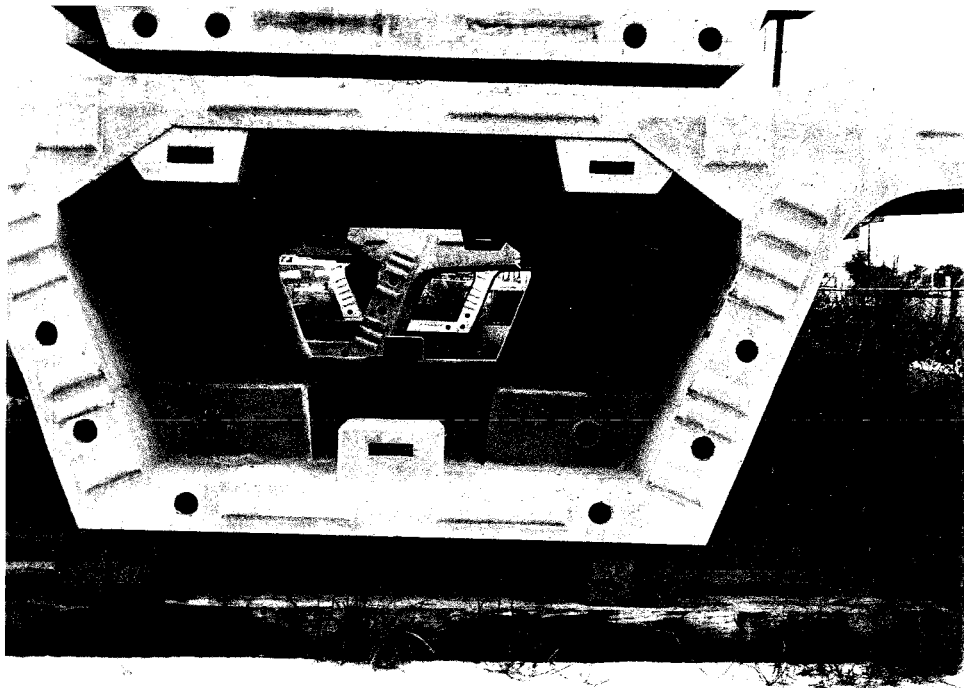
Box Girder Segment with Internal Ducts in Webs.
